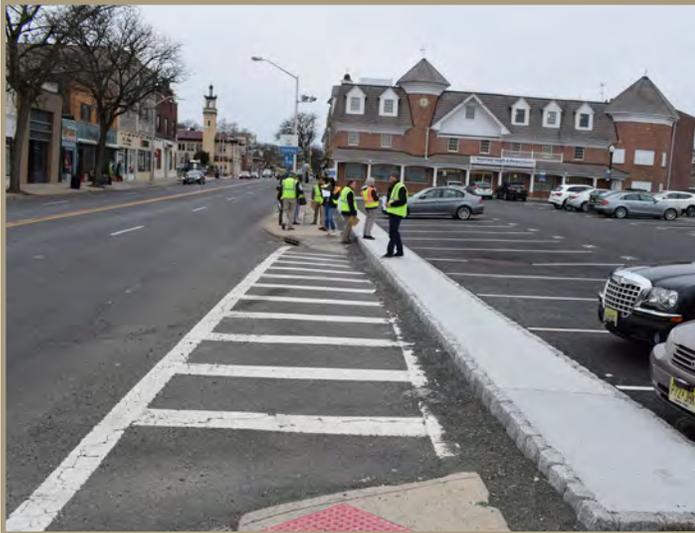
The old crosswalk at the Lenox Avenue intersection, where the roadway was closed and the municipal parking lot expanded, looking westward on North Avenue.
